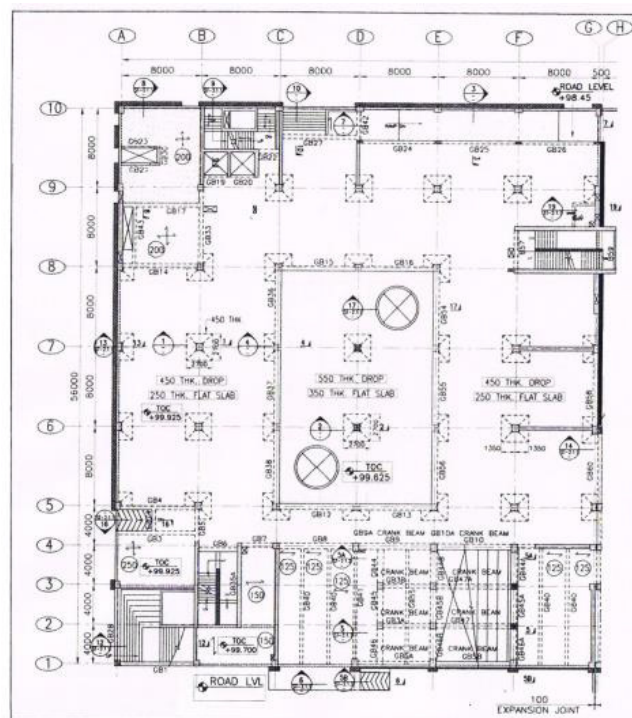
Typical Plan of formwork working drawing for a multistory building
